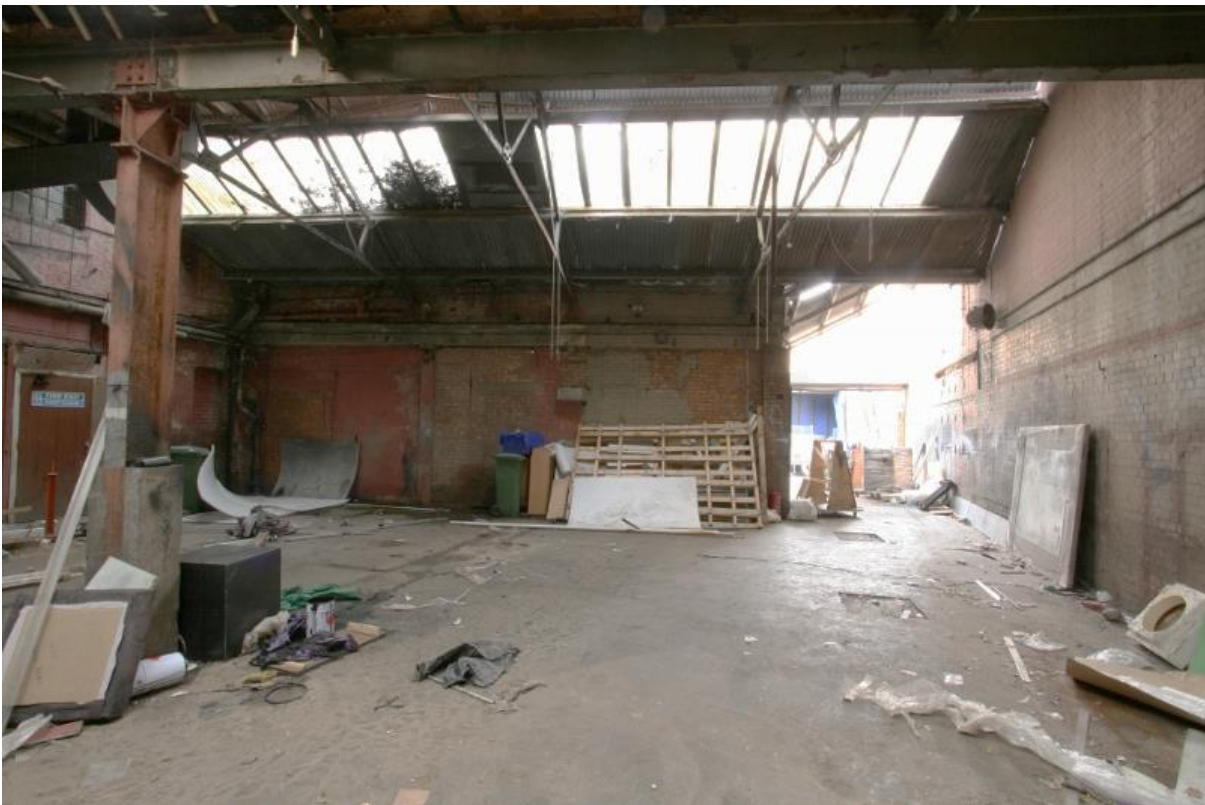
Rolled steel column (left) supporting overhead steel joists in loading/delivery area B2G2, looking east (VAL14 D100 (17))
